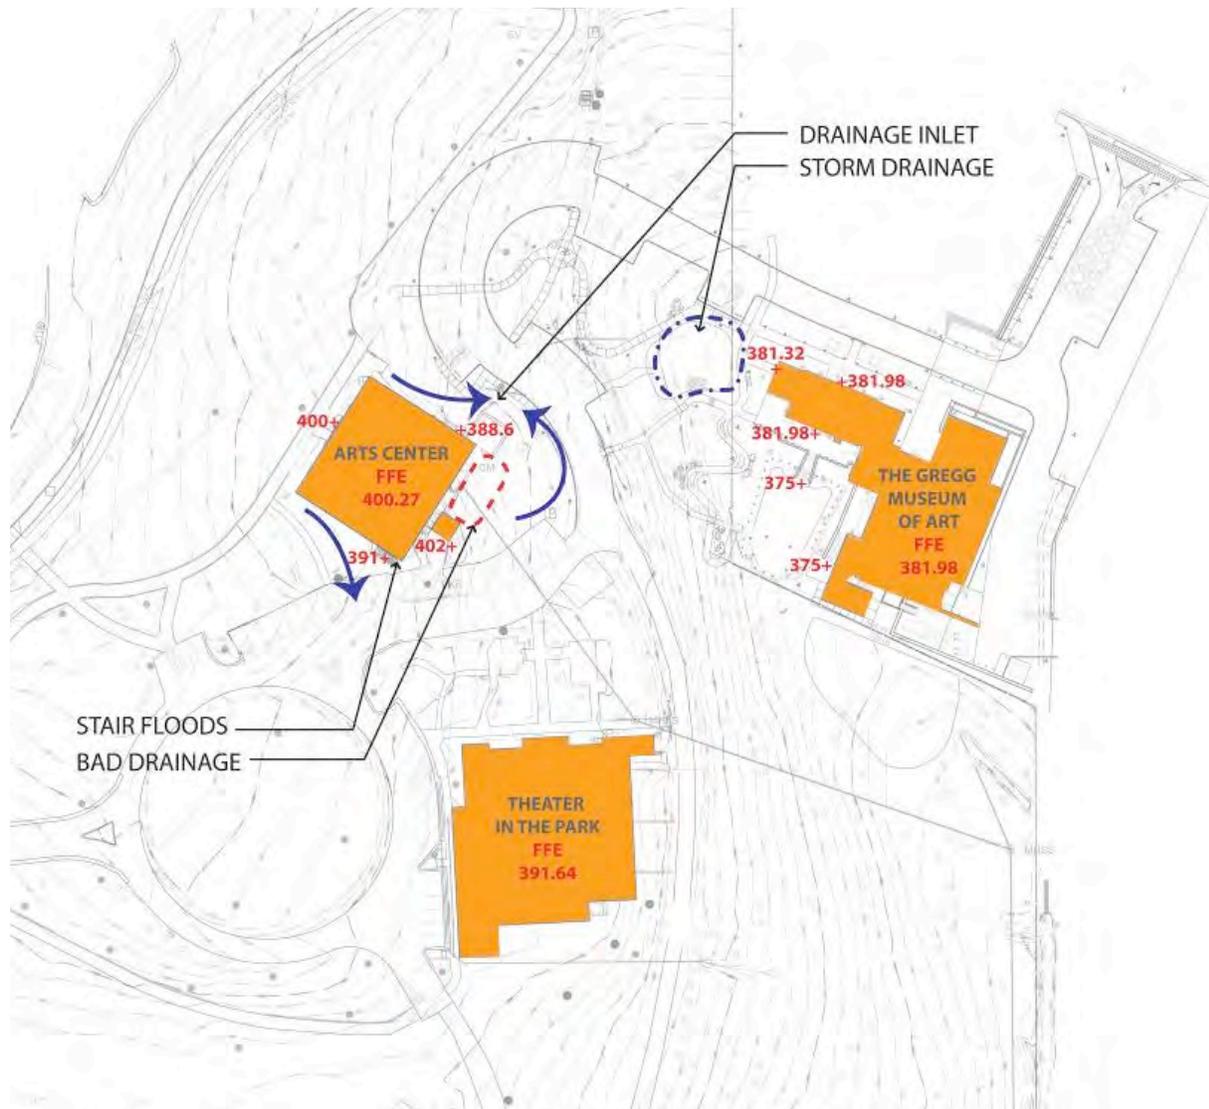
Provides topographic information regarding the site and the existing buildings. The existing building embraces the existing landform.
